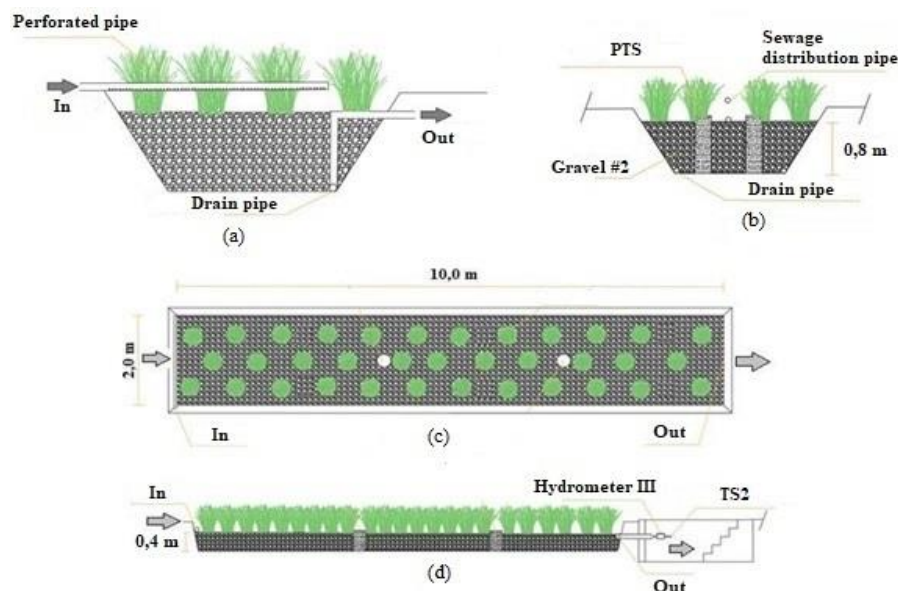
(a) Longitudinal profile and (b) cross section of the VS-CW and (c) floor plan and (d) longitudinal profile of the HS-CW.
